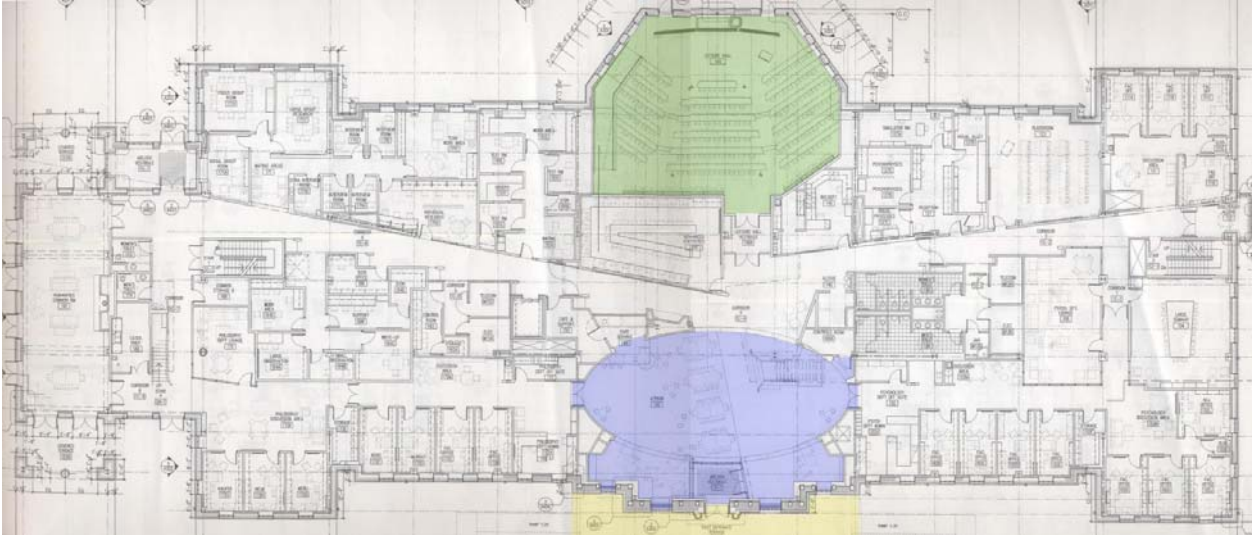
First Floor Plan – Life Sciences & Philosophy Building
